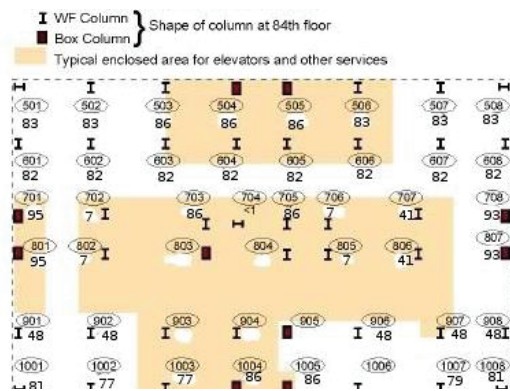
Structural plan view of core column in WTC towers on a typical level (Floor 84)
